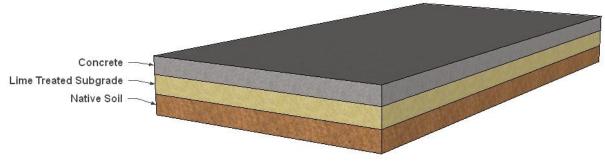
OPTION 1 RIGID PAVEMENT TYPICAL SECTION
